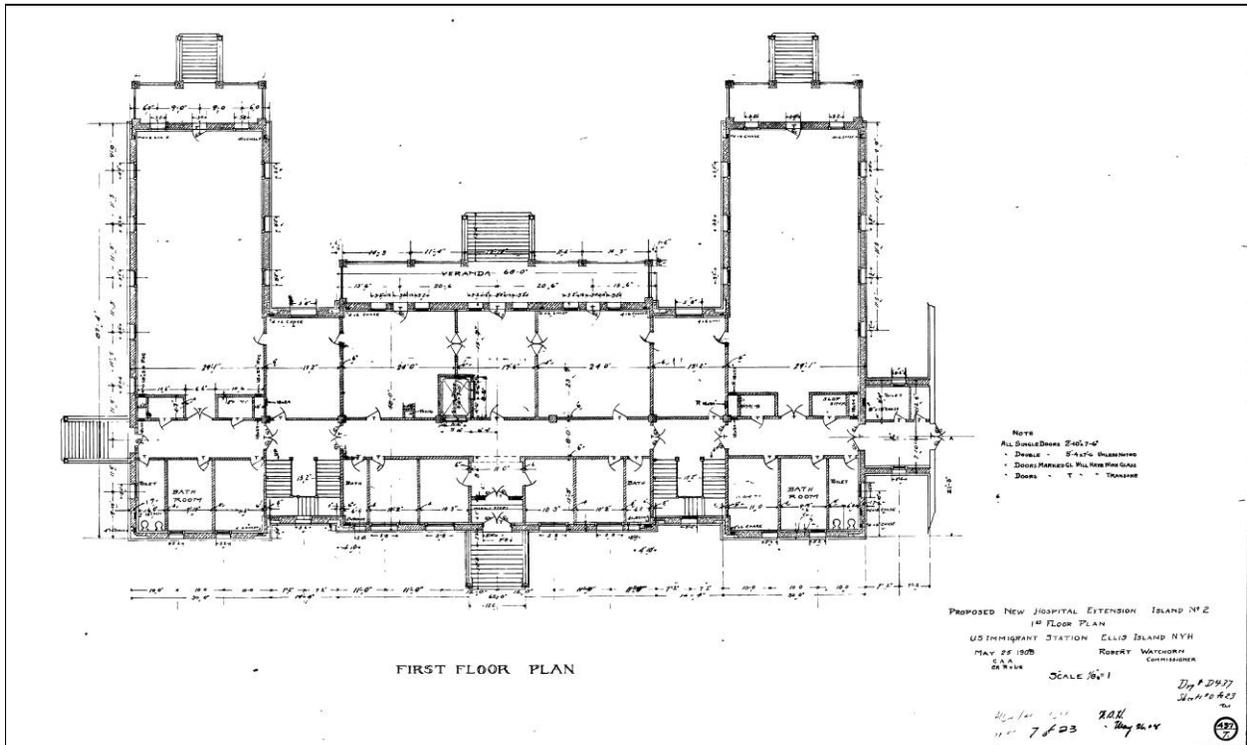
First Floor Plan, Proposed New Hospital Extension (Hospital Building No. 2), 25 May 1908.
